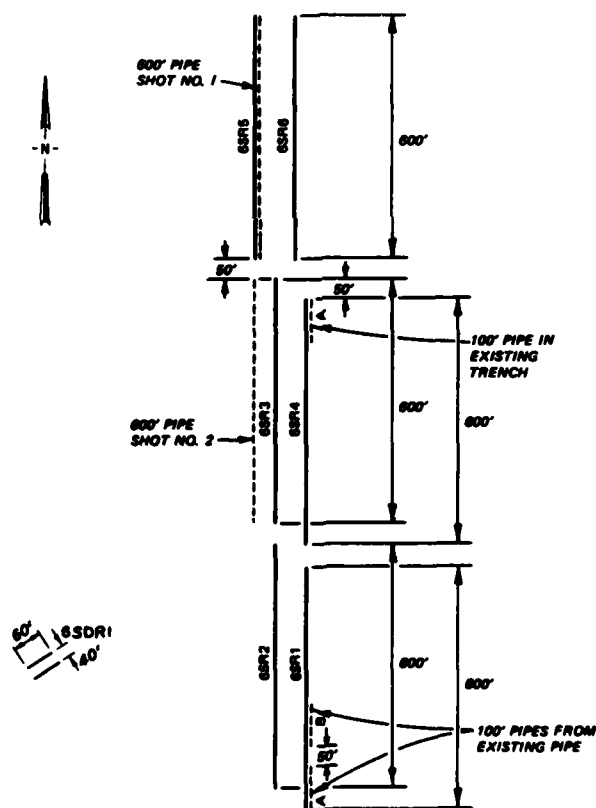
Pipe shot layout at North Cibola site. Solid lines indicate layout for 1978 tests. Dotted lines indicate where pipes were placed for 1980 tests
